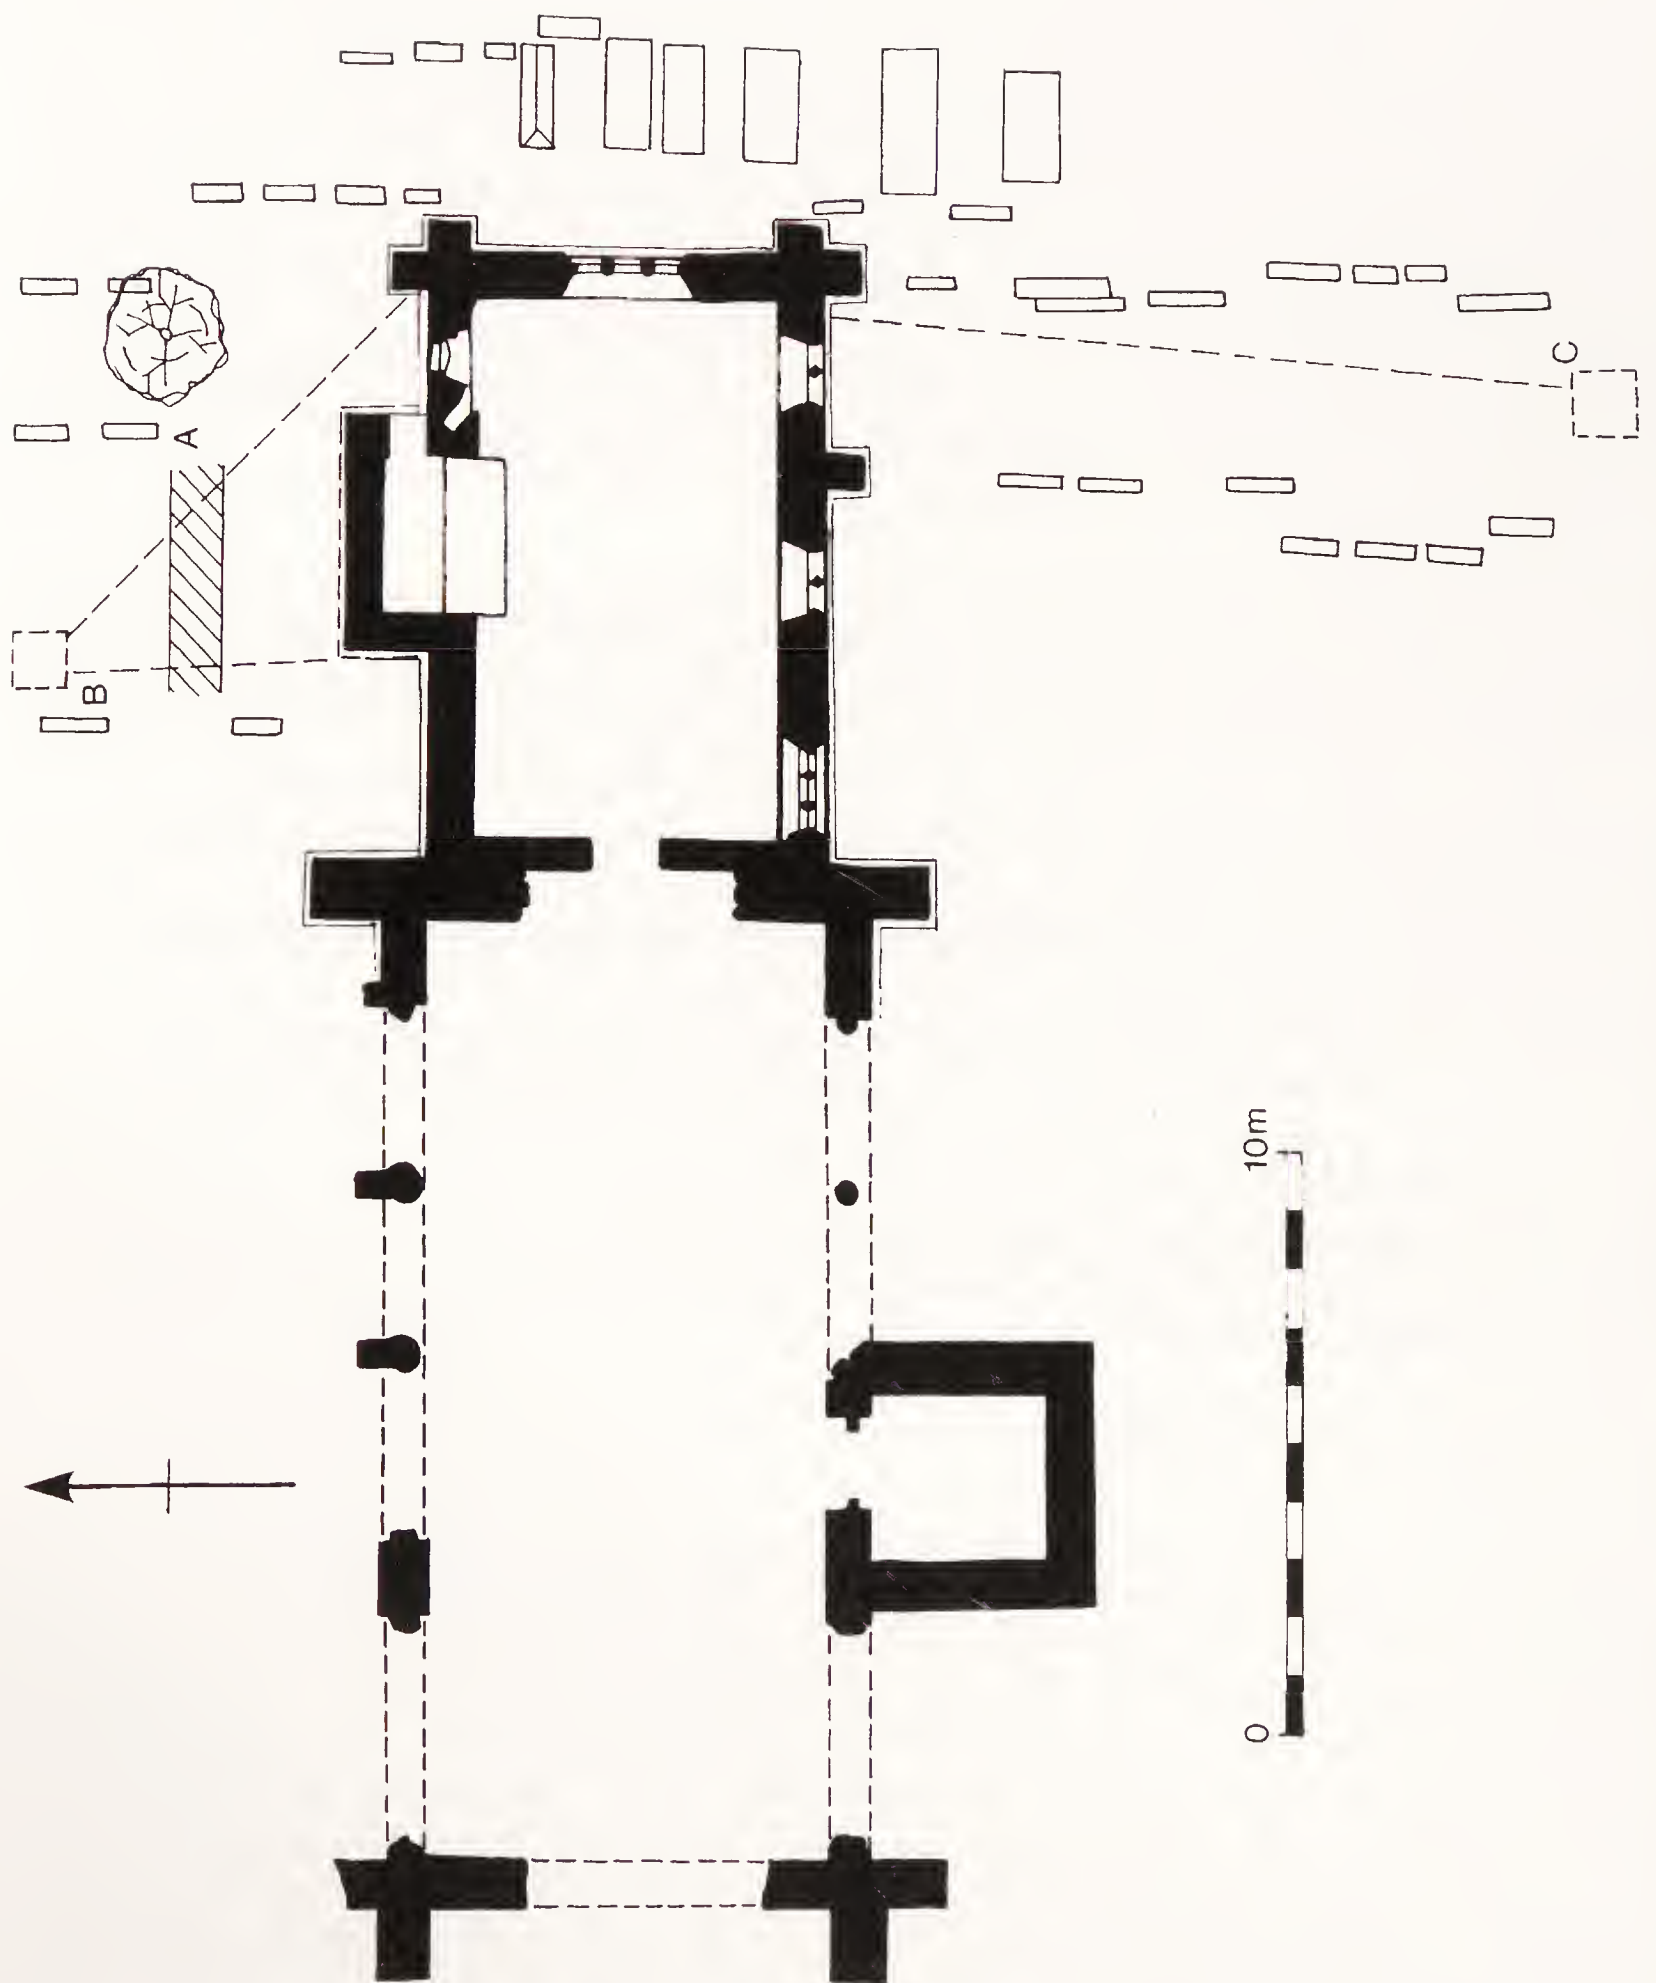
Sketch plan of Whorlton Old Holy Cross church, showing drainage excavations around the chancel and the location of the chantry chapel north wall.
